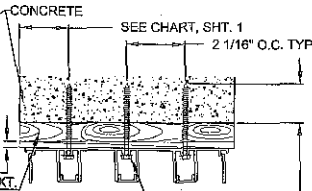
TRACK FRAME HEAD WOOD INSTALLATION
